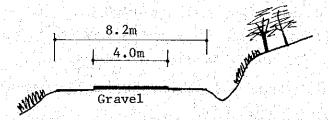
EXISTING ROAD (Ng. MEDAMIT ∿ LIMBANG)
